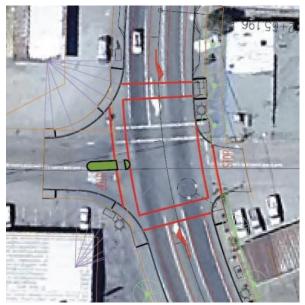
Potential median design for intersection of Highway 101 and Branscomb Road (Source: Laytonville Traffic Calming and Revitalization Plan, 2008)
